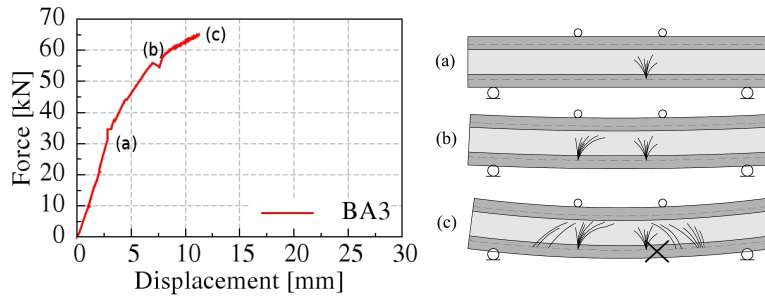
Bending test results for selected small-scale beam specimens with acrylate adhesive.
